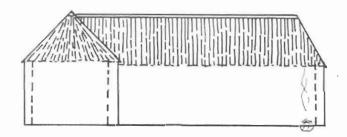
A new floor hearth was installed against the end wall E2 (>1730).
